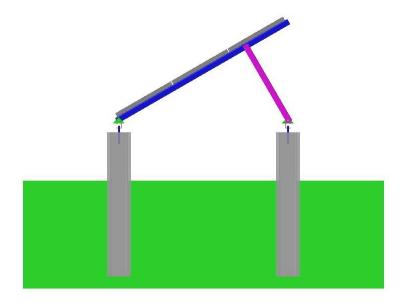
Ground mount and concrete foundation. Flat concrete roof installations can attach to the concrete roof directly or an added foundation can be cast on top of existing roof.
